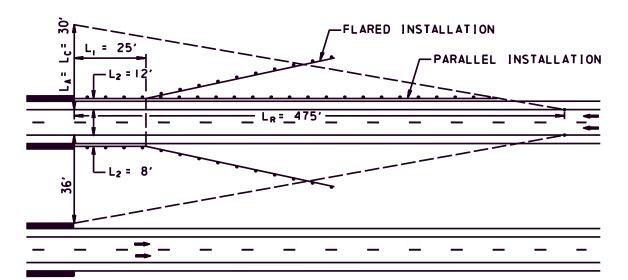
(ENGLISH) EXAMPLE OF BARRIER DESIGN FOR BRIDGE APPROACH
